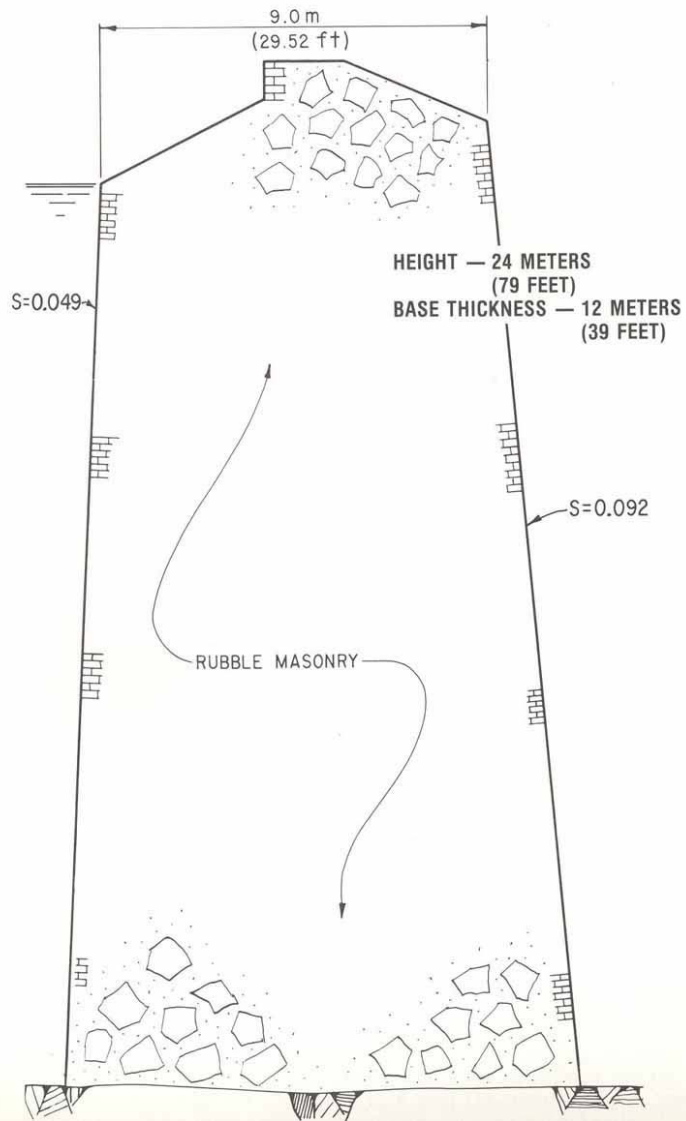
Elche Dam, cross section. P-801-D-79296.
